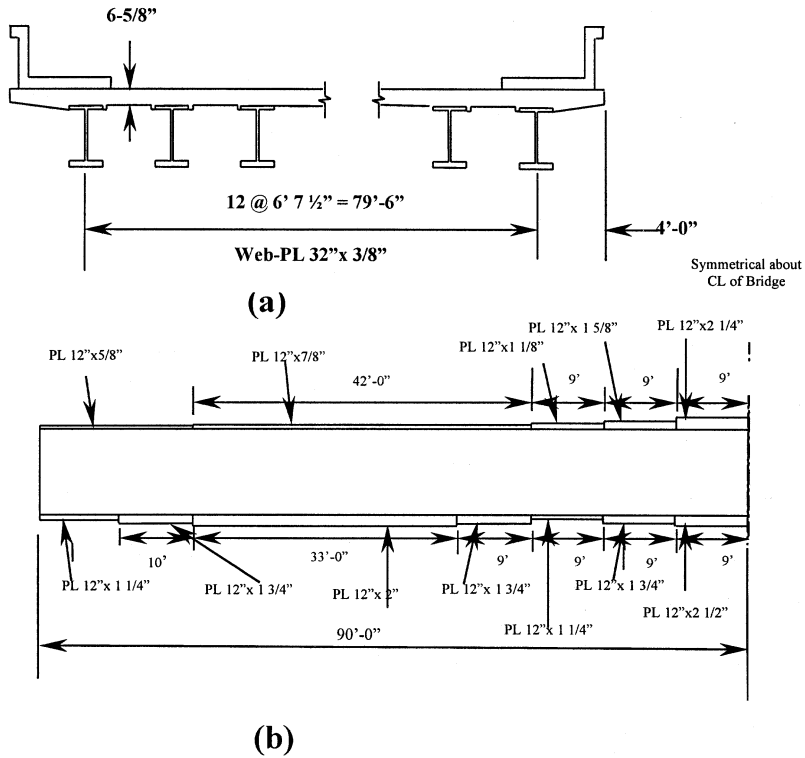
Details of two-span continuous steel girder bridge example. (a) Typical section; (b) girder elevation.
